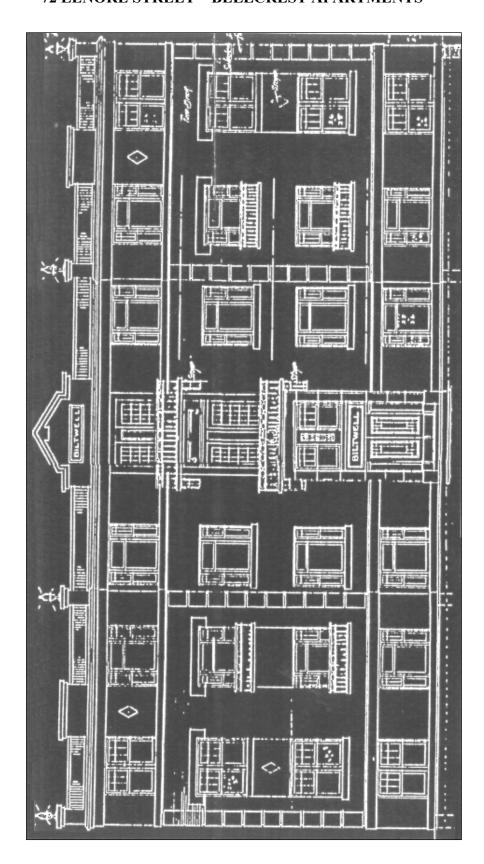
Plans for the "Biltwell" (Bellcrest) Apartments, 72 Lenore Street; built in 1928, supervising architect and builder, Bently Taylor; "Lenore Street Elevation." (Reproduced from Plans 2973/1928, held at the City of Winnipeg Archives, William Avenue.)
